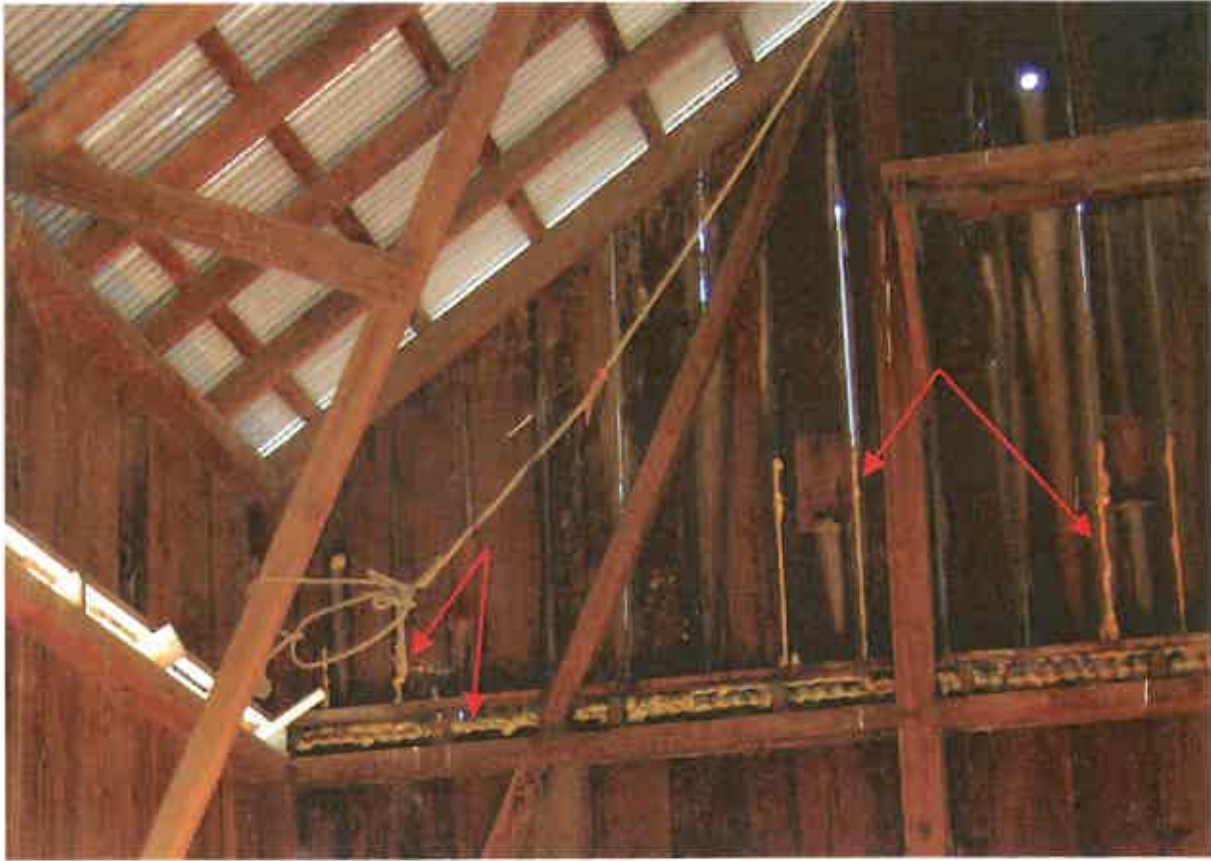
Deterioration in the area where the corrugated shed roof meets the exterior wood siding at the south elevation.
